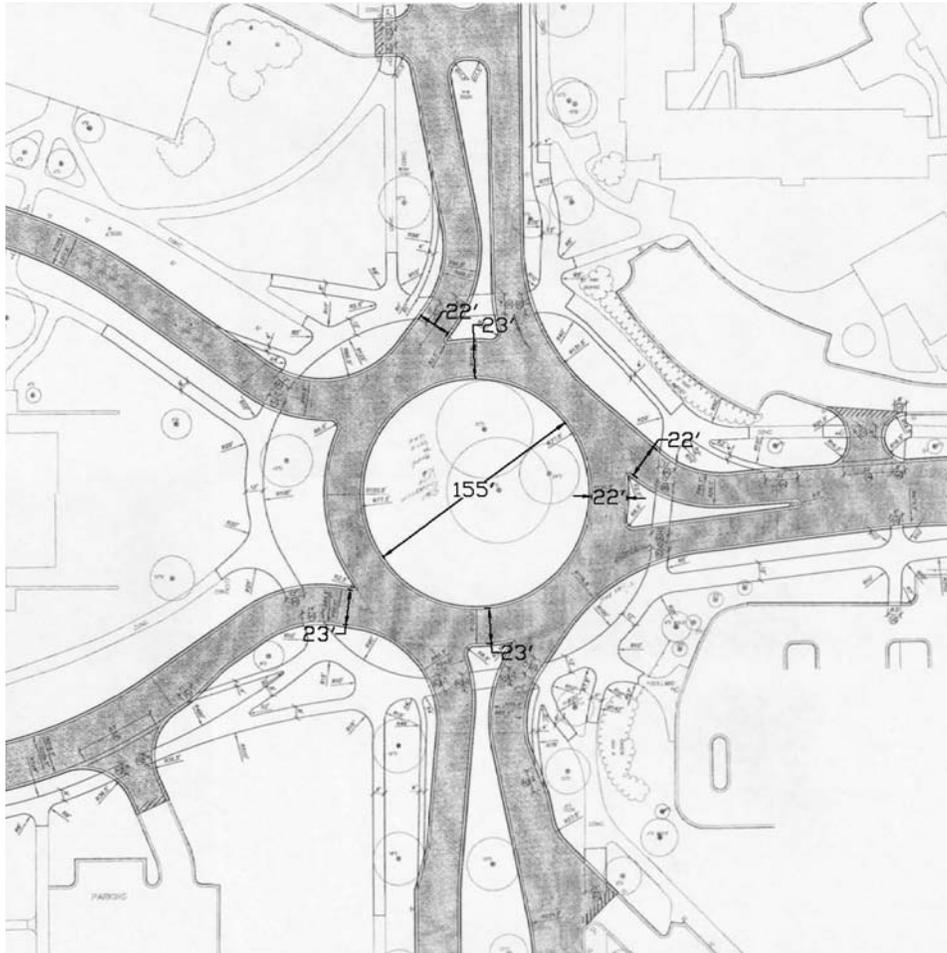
Example of a multilane roundabout with narrow entry and circulatory roadway widths.
